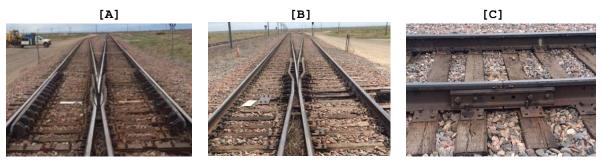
Turnout and frog, switch left [A] and switch Right [B]; steel bridge [C].
